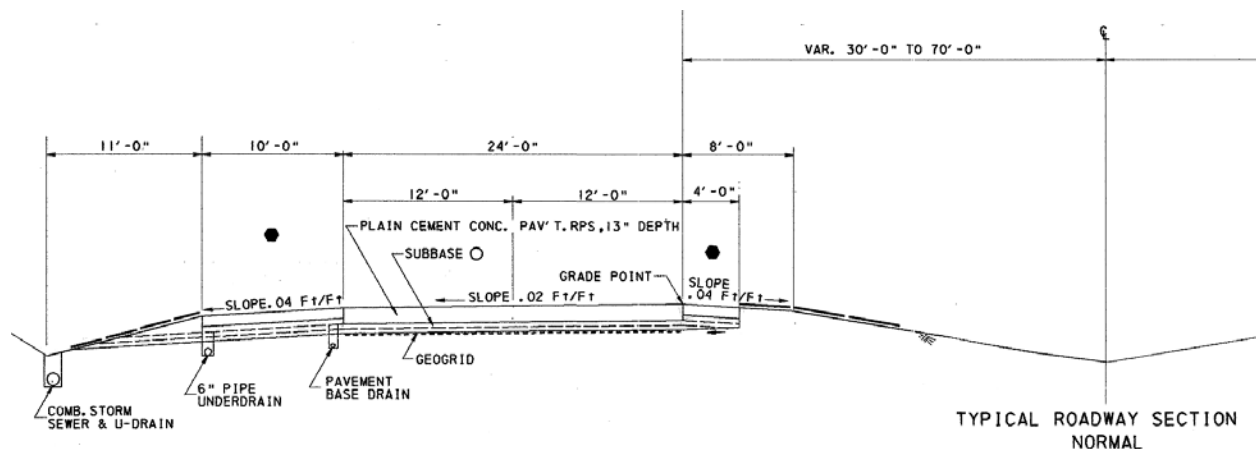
Typical cross section of I-70 from plans of 1980s highway reconstruction
